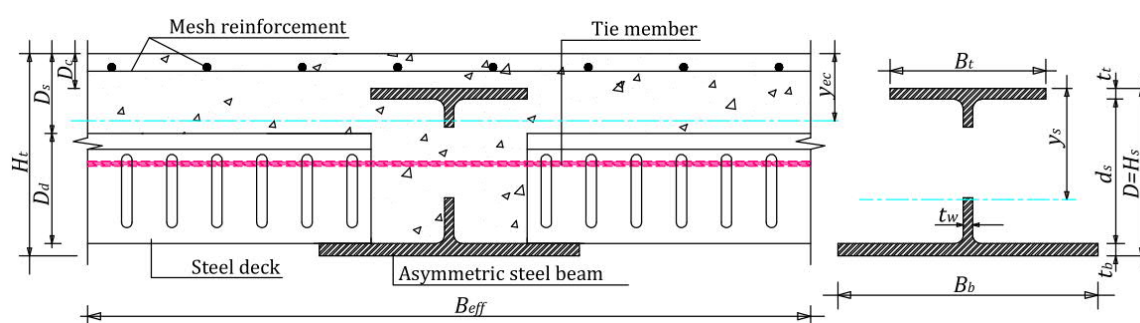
Geometrical configuration of shallow cellular beam with shear connection arrangement
